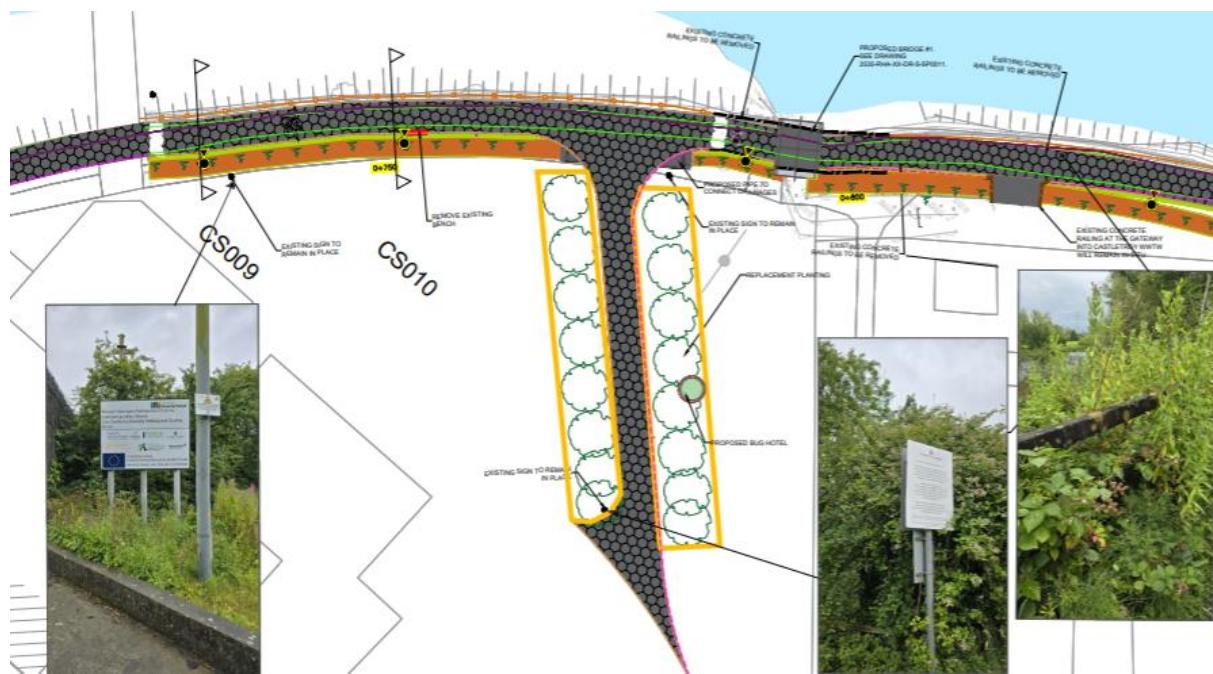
Proposed tree planting area west of proposed Bridge 1
